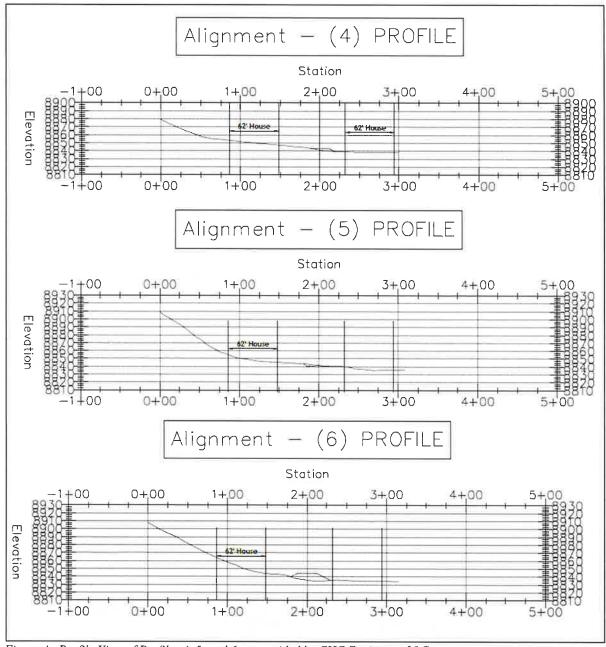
Profile View of Profiles 4, 5, and 6 as provided by CHC Engineers, LLC.
